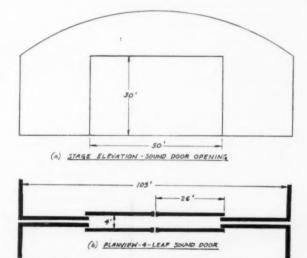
(Top) Stage elevation and (bottom) plan showing important dimensions of 4-leaf inside sliding doors.
